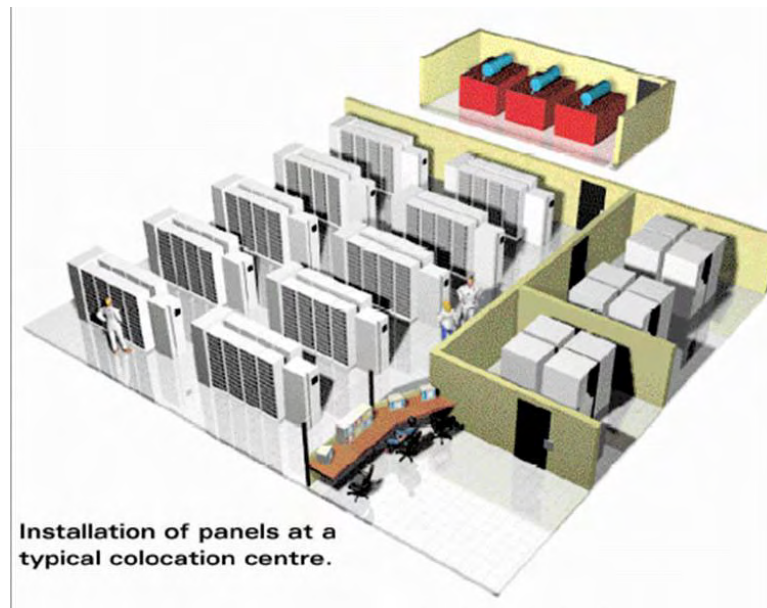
Typical Rack Layout for Server/Telecom/Computer Equipment Installations¹⁰⁸
